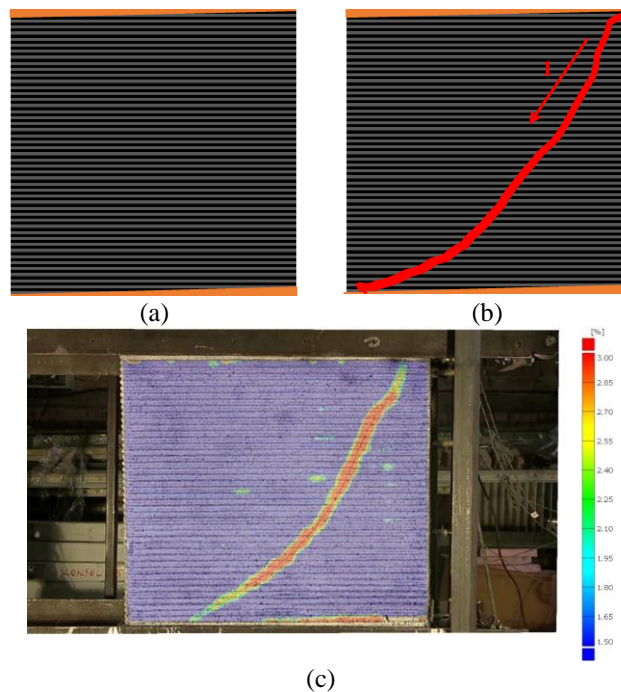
Crack Propagation Process: (a) Initial Damaged Wall from the First Test, (b) Brittle Diagonal Failure of the Front Face, and (c) Brittle Diagonal Failure of the Front Face Captured by DIC
